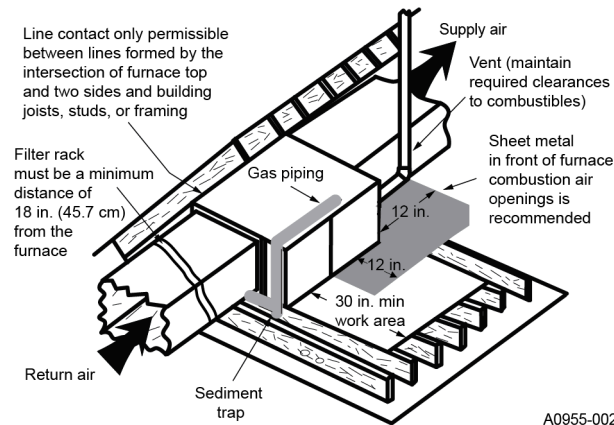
Typical suspension of furnace in an attic or crawl space installation
